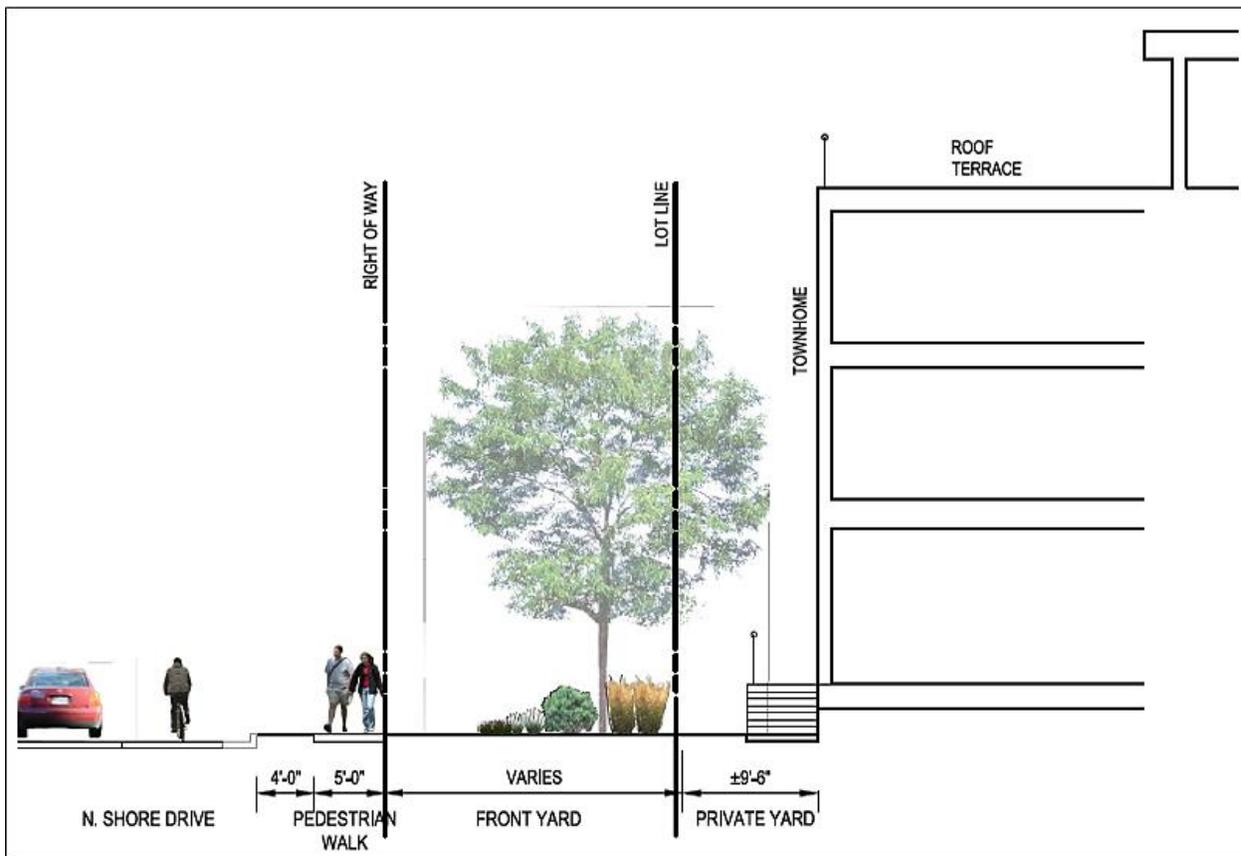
B: North Shore Drive streetscape cross section, Source: Sheet 34 of PRC Plan/SE Plat
